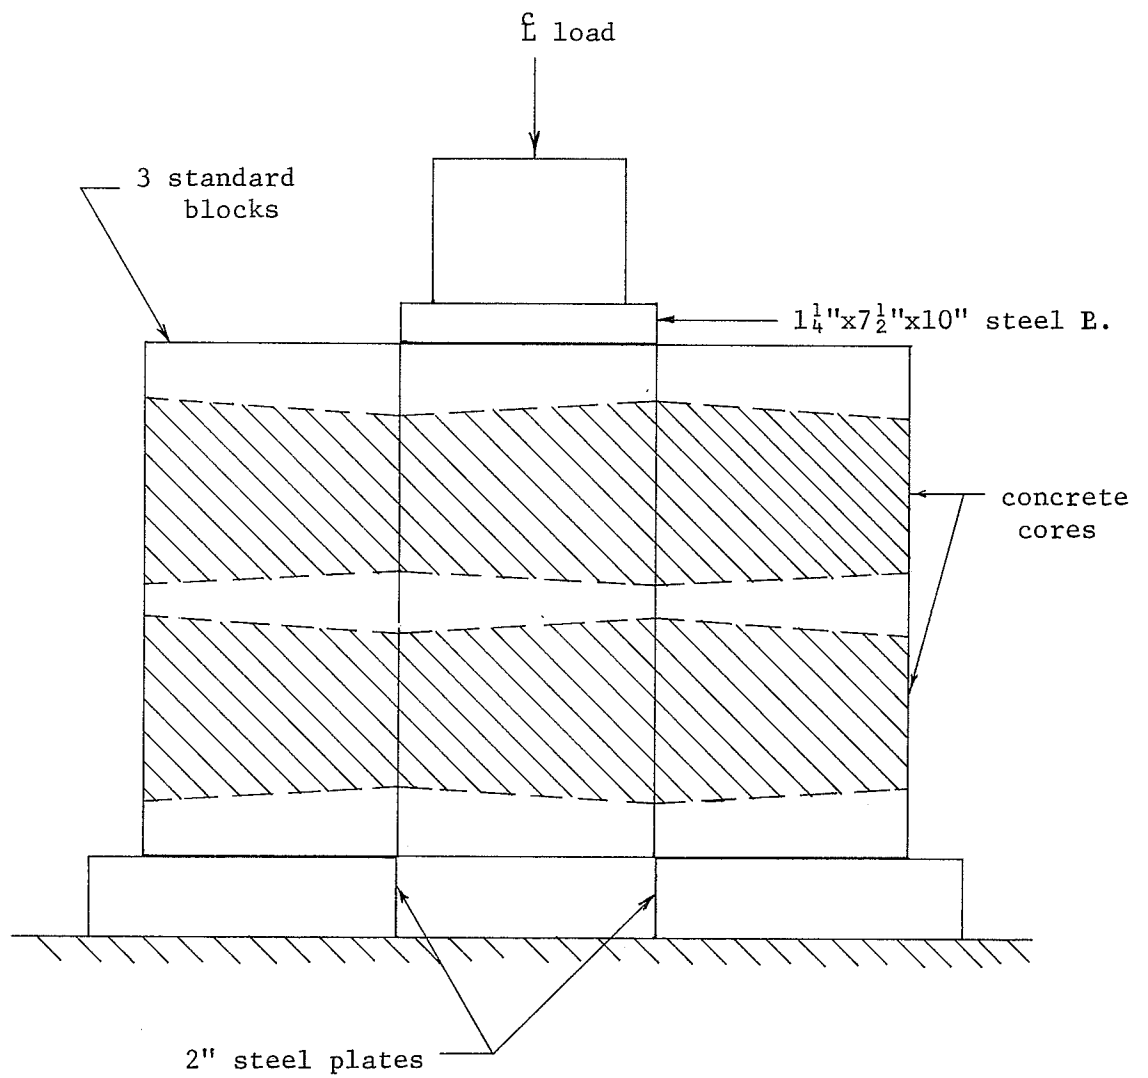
DIAGRAM OF SHEAR TEST ON CONCRETE
